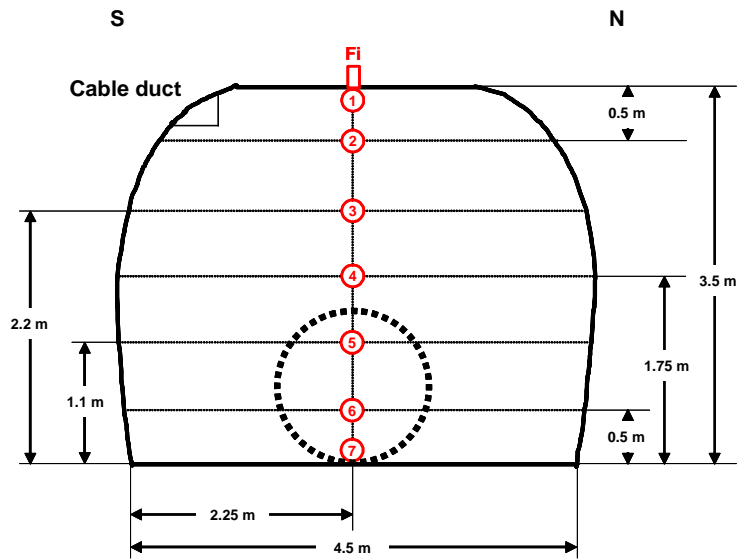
Backfill sampling locations (samples 1 to 7) and rock sampling locations in the roof (samples Fi) for porosity and permeability measurements in cross section G1
